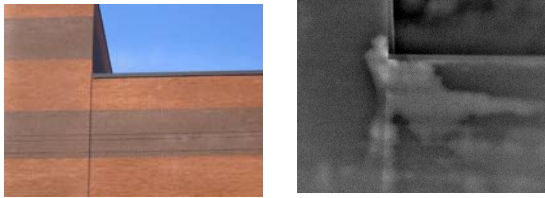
Conductive heat loss from exterior walls and roof due to poor placement of insulation.
